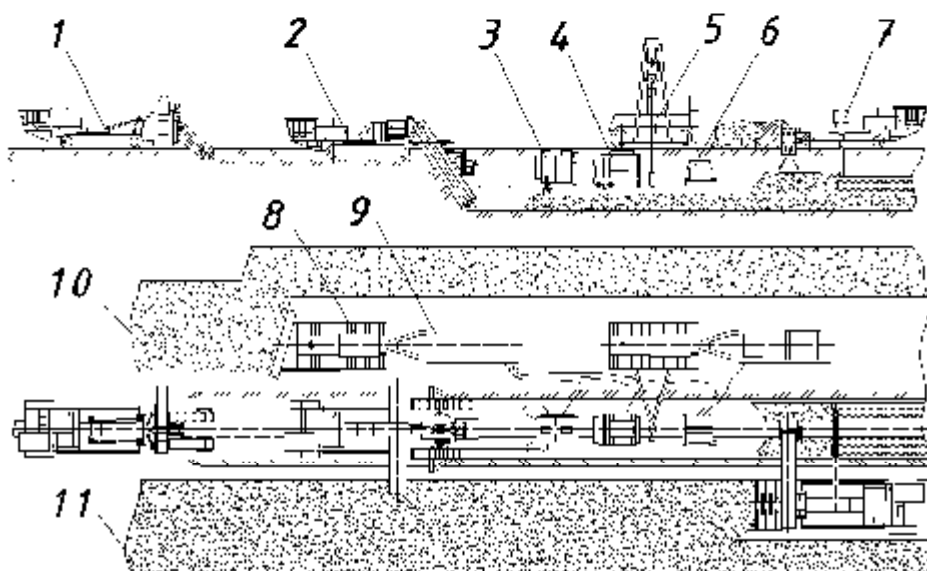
Technology repair pipelines: 1 – machine digging the soil layer; 2 – machine unearthing pipeline; 3 – machine digging soil pipeline; 4 – machine removing isolation; 5 – pipeline compiler; 6 – machine causing isolation; 7 – machine for soil compaction; 8 – bulldozer; 9 – diesel power; 10 – fertile ground; 11 – mineral soil
